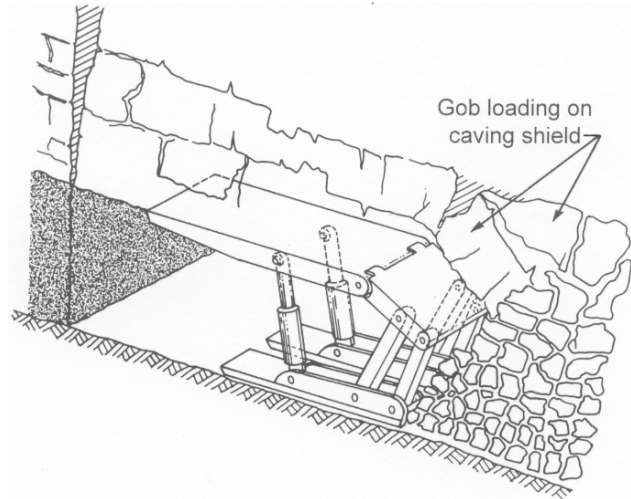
Horizontal loading toward coal face induced by gob loading on caving shield.
